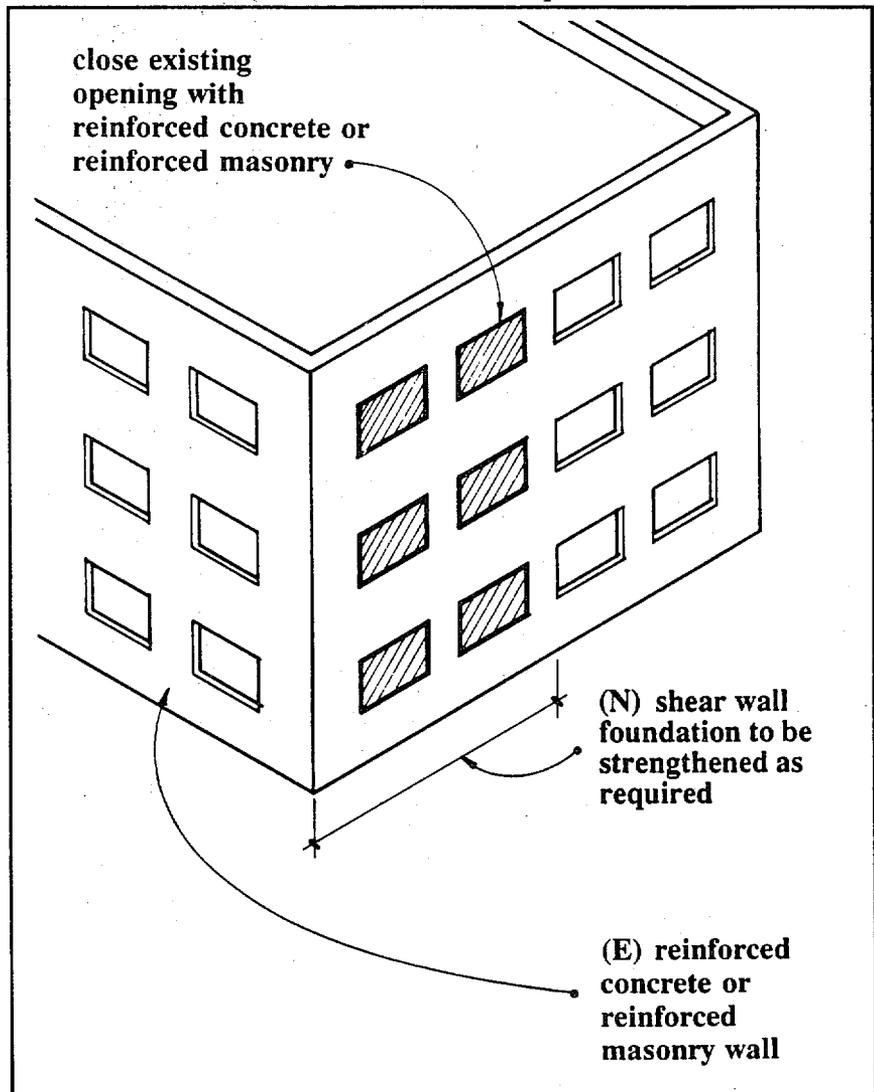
Strengthening an existing shear wall by filling in existing openings.
